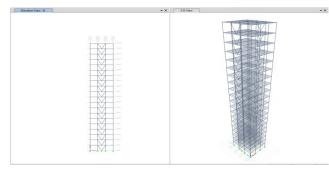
Elevation and 3D view of the building with V bracings at center bay
